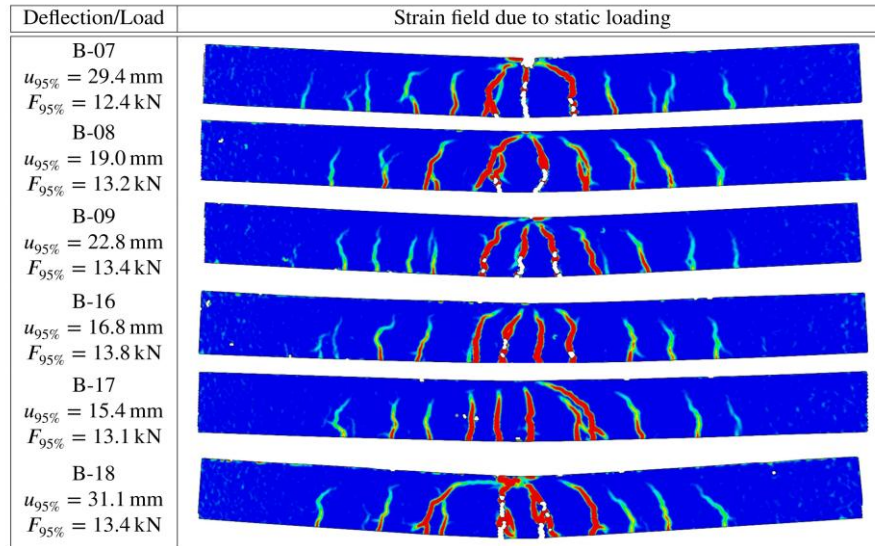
Crack patterns for Series-3 (reference beams), static loading.
